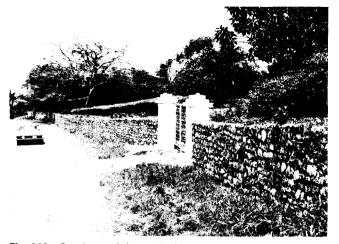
Gravity retaining wall of stone; Mr. Turqui's residence, Aburi, 1980.
